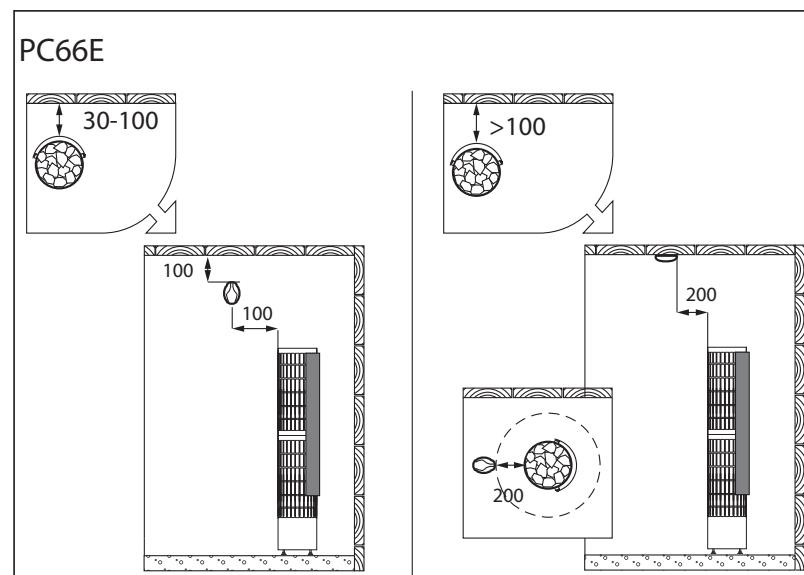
Installing the sensor (all dimensions in millimeters)
